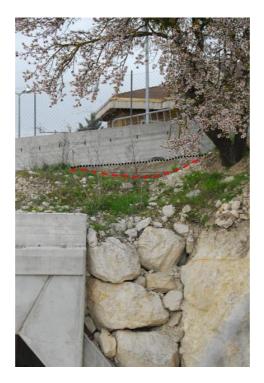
Settlement trough reaching 10 to 1 5 cm ma ximum, relative to the spanning parapet wall foundation (42.358N 13.415E).
